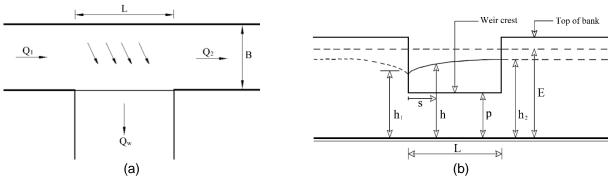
Schematic view of a sharp-crested rectangular side weir; a) plan, b) section.
